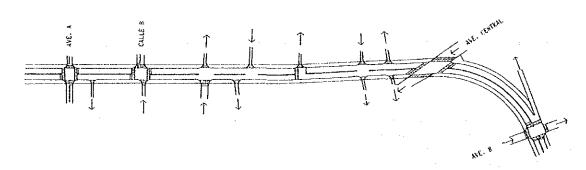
INTERSECTION PLAN OF CORREDOR SUR EXTENSION
